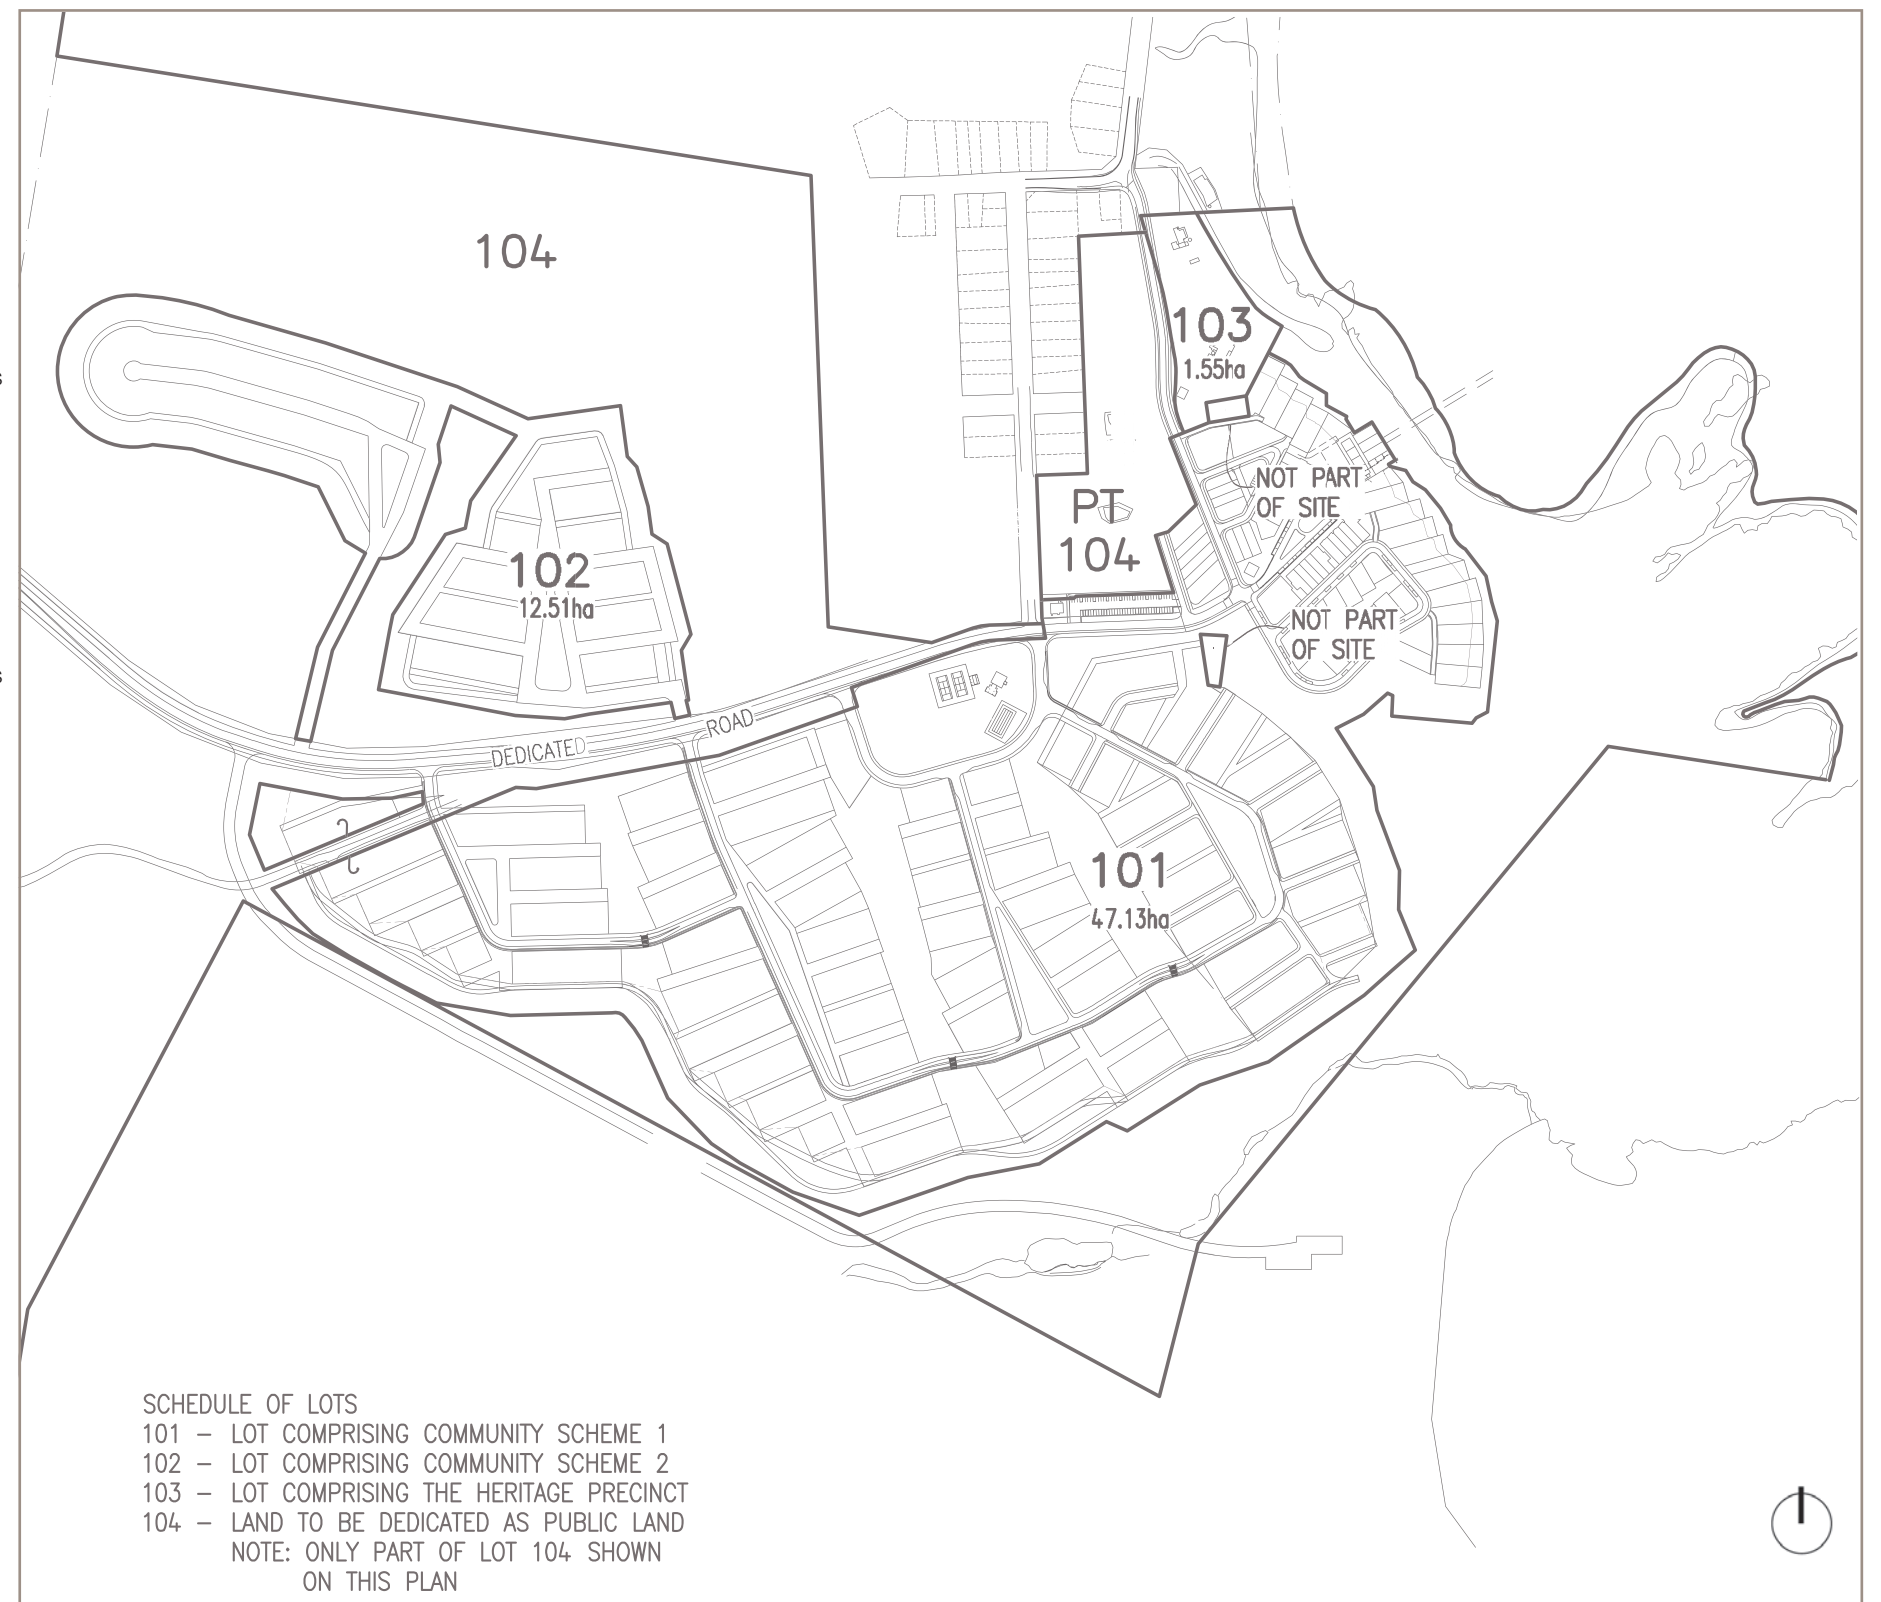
The Moonee Hamlets Ownership Plan.
